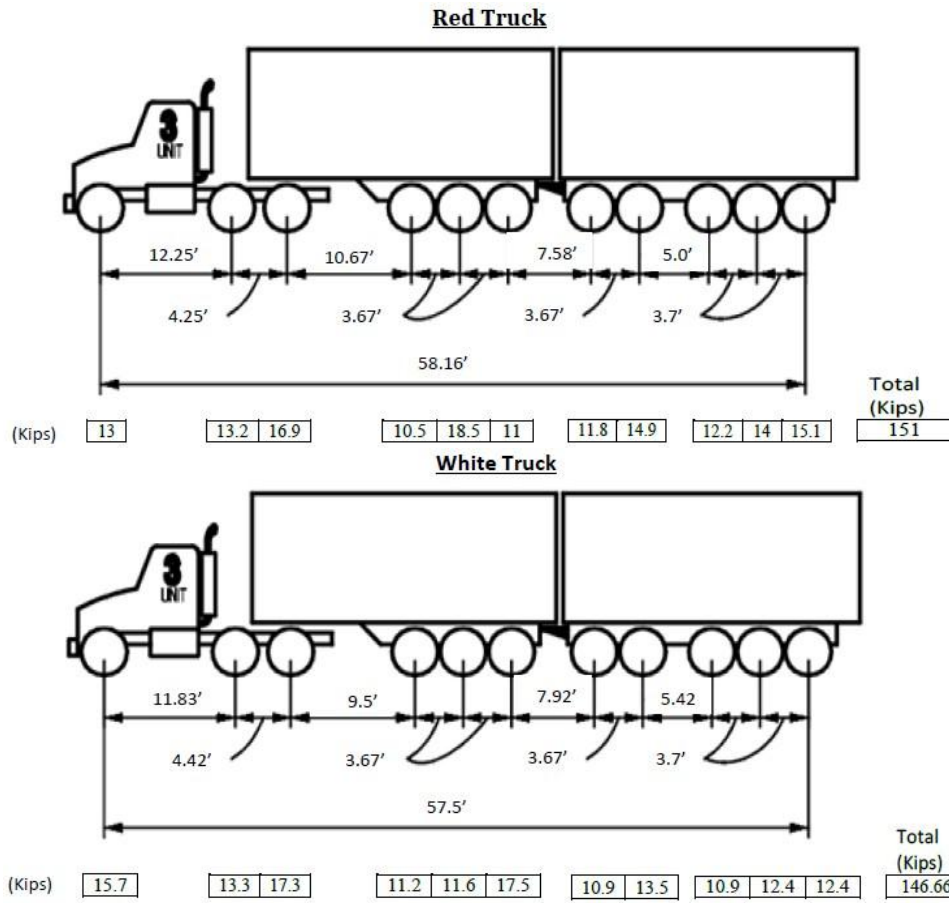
Bridge 1 (Centerline Rd.) Trucks.
